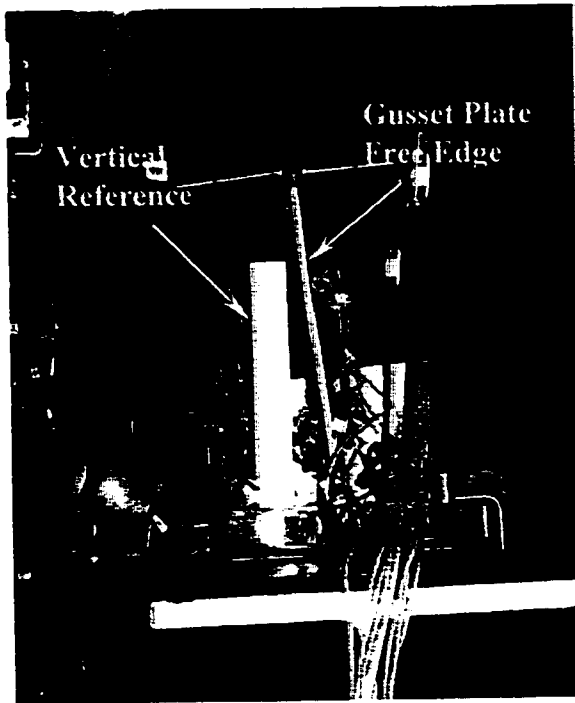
Out-of-Plane Deformation of Gusset Plate Free Edges – Specimen T-3
